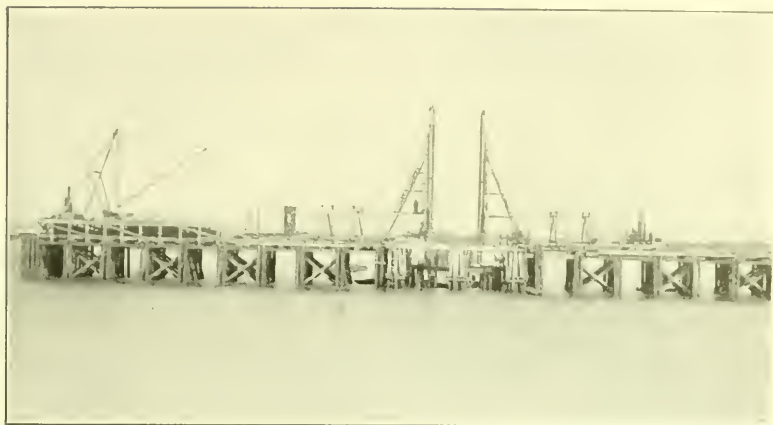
DRIVING FOUNDATION PILES FOR PIVOT PIER, DUMBARTON POINT DRAW.
